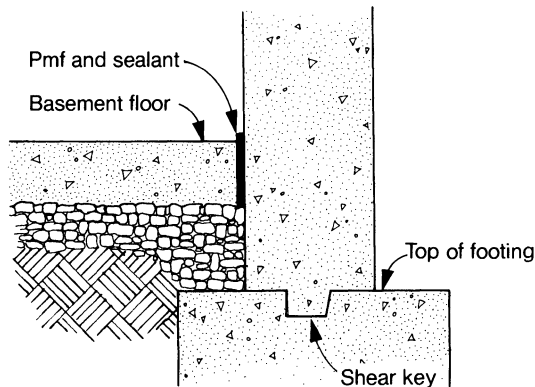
Earth pressure transfer from basement wall to footing.
